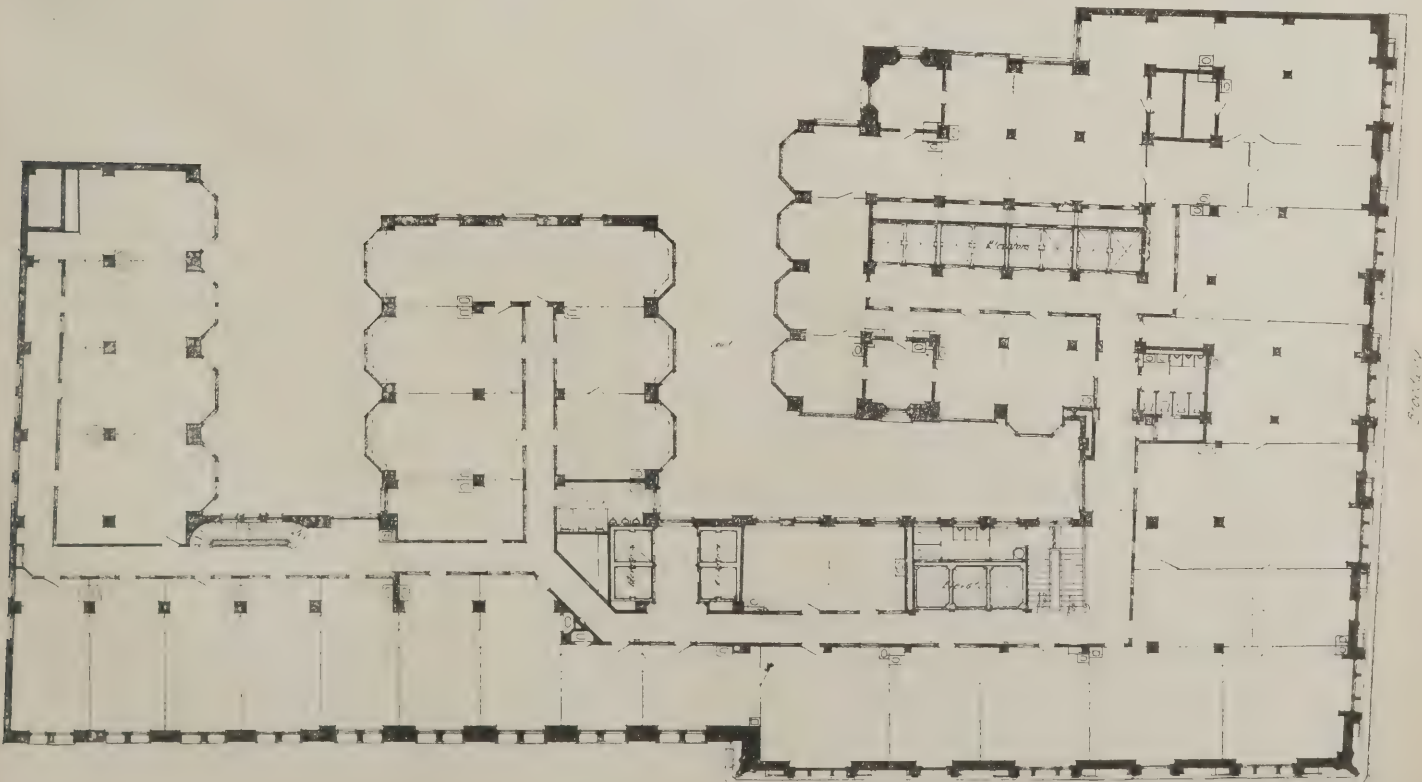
TYPICAL FLOOR PLAN IN THE SINGER BUILDING.
